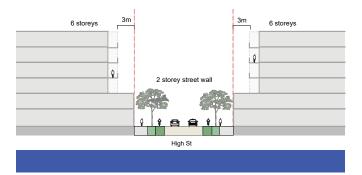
High Street, High Street North Precinct. A two-storey street wall height is proposed, consistent with the existing character.
